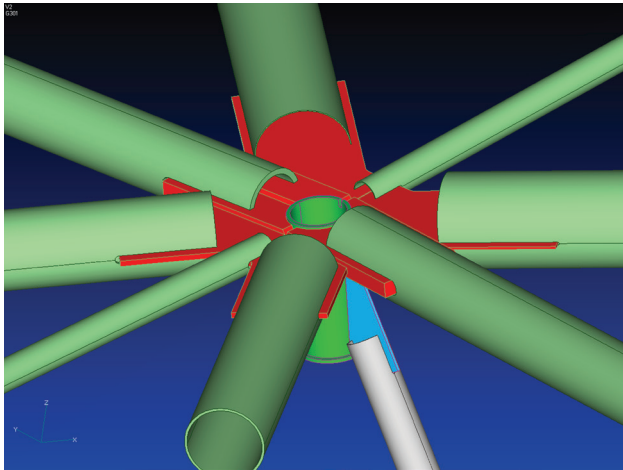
Top surface connection of space truss with 9 members framing into it.
